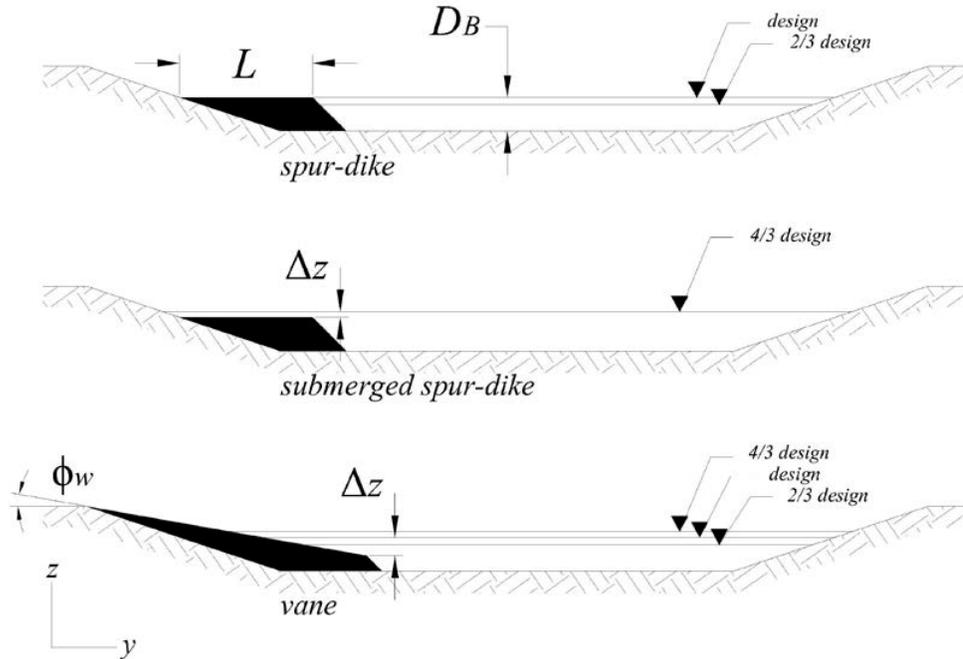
Cross section and structure profile view schematic of evaluated structures in trapezoidal model (Scurlock et al. 2012).
